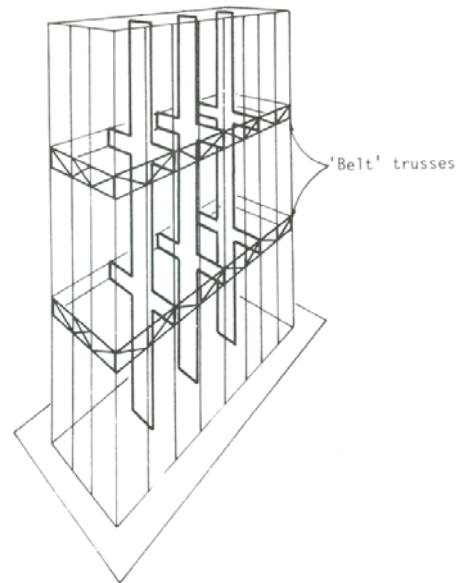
Belt trusses in an outrigger-braced structure [33]
